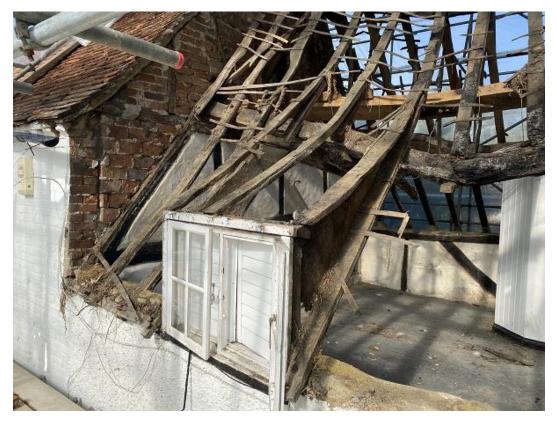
South-facing roof slope looking north, showing construction of westerly dormer
